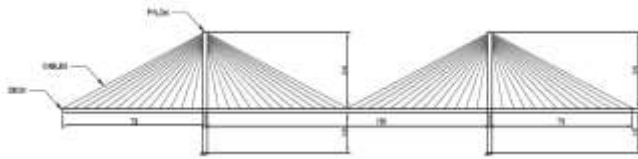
longitudinal section of cable stayed bridge (all dimension in m)
